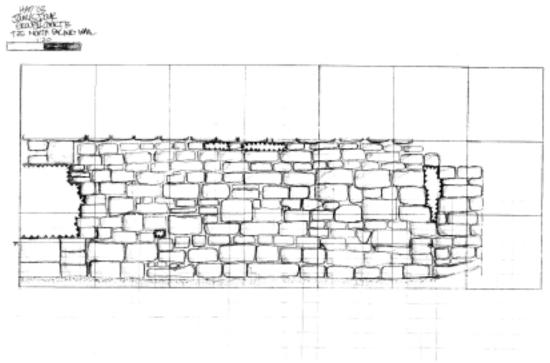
Profiles of walls in vaulted passage under Str. 43.
